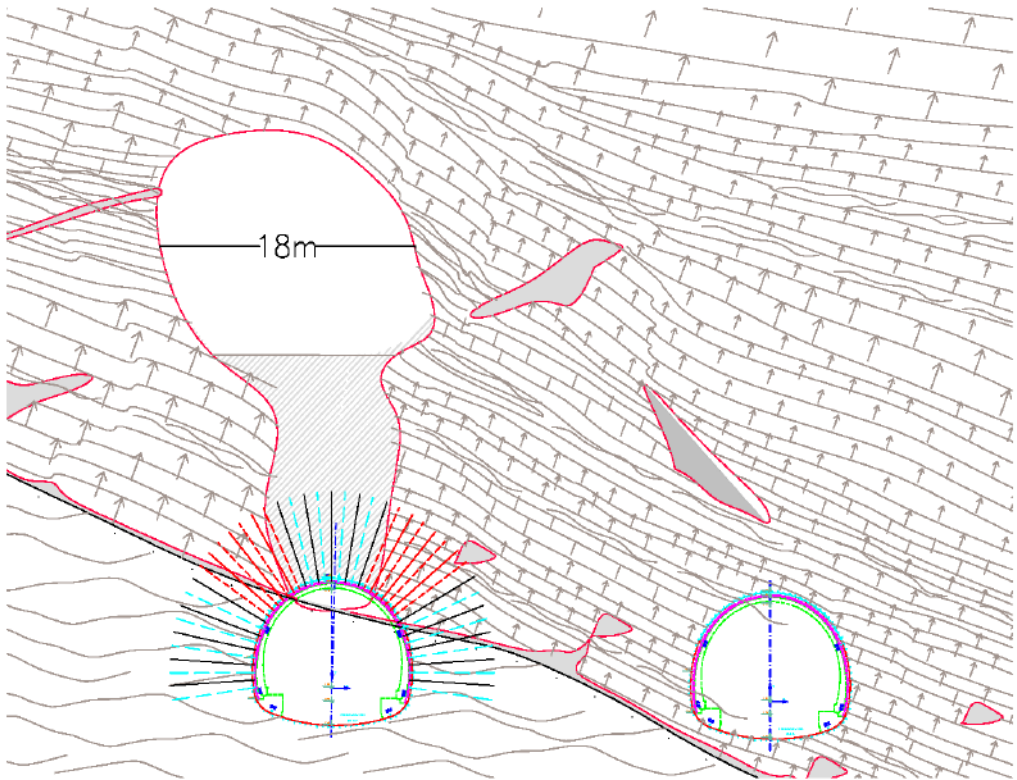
A schematic showing the layout of the tunnel tubes and the cavern encountered during the excavation of tunnel Ivan.
